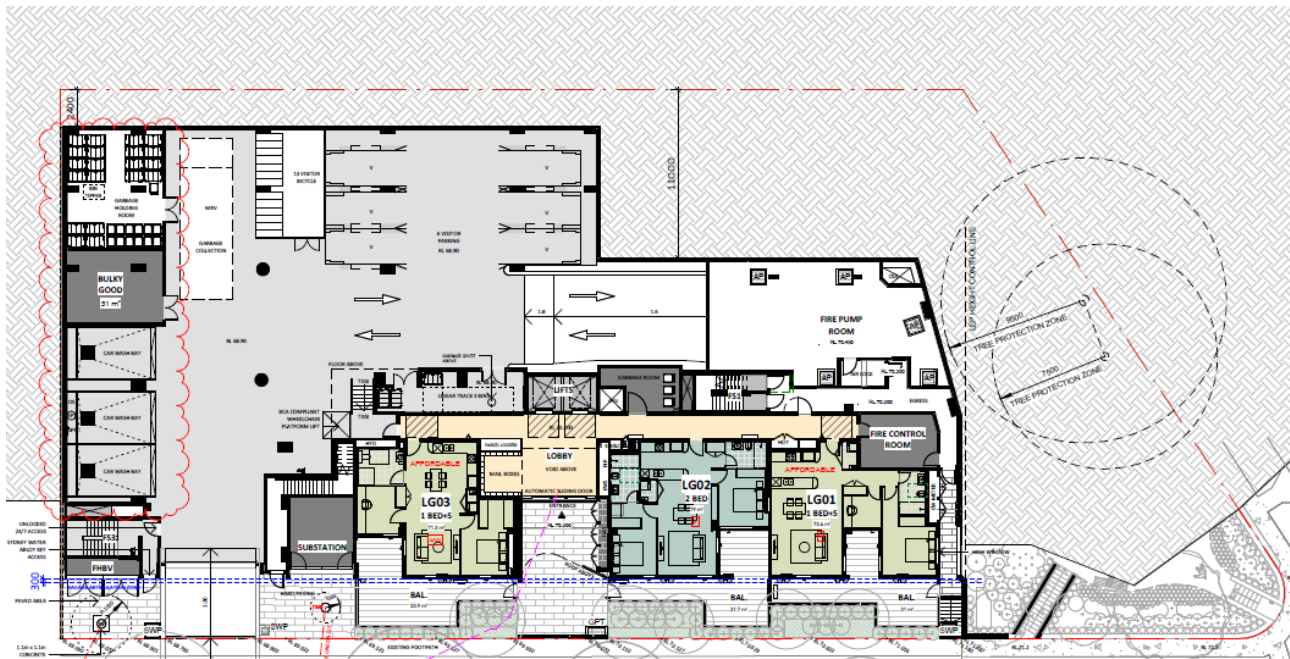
Lower Ground Floor Modifications (Source: Plans)
